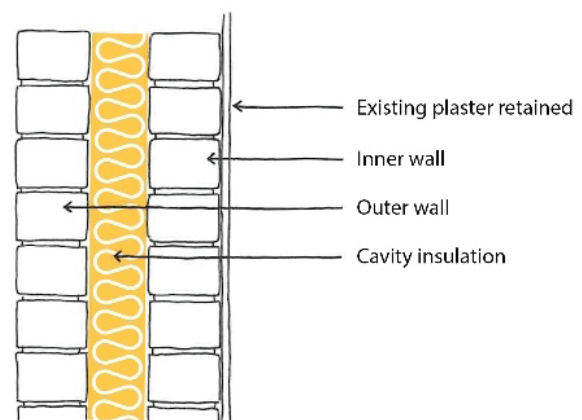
CAVITY WALL INSULATION (USING BRICK WALL EXAMPLE)
